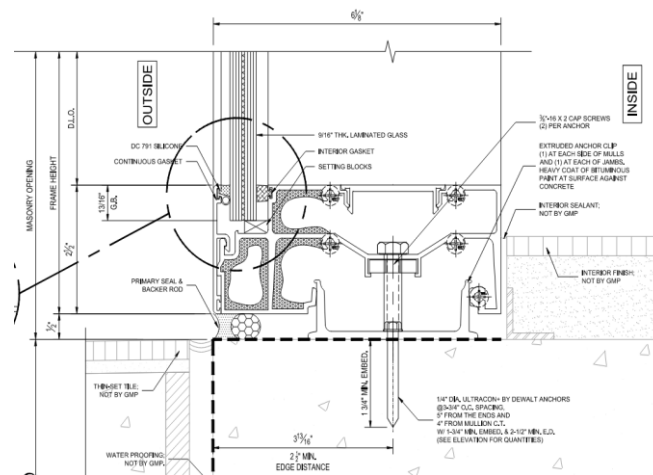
Typical Balcony Sliding Glass Door Sill Detail Showing Frame Support, Anchorage, Shims, and Drainage at the Concrete Slab Edge.
